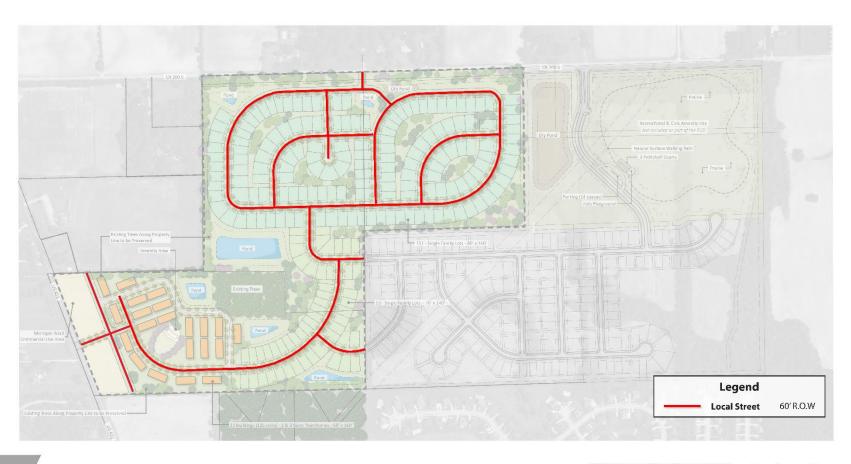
STREET TYPOLOGY PLAN AND STREET AND TRAIL STANDARDS
